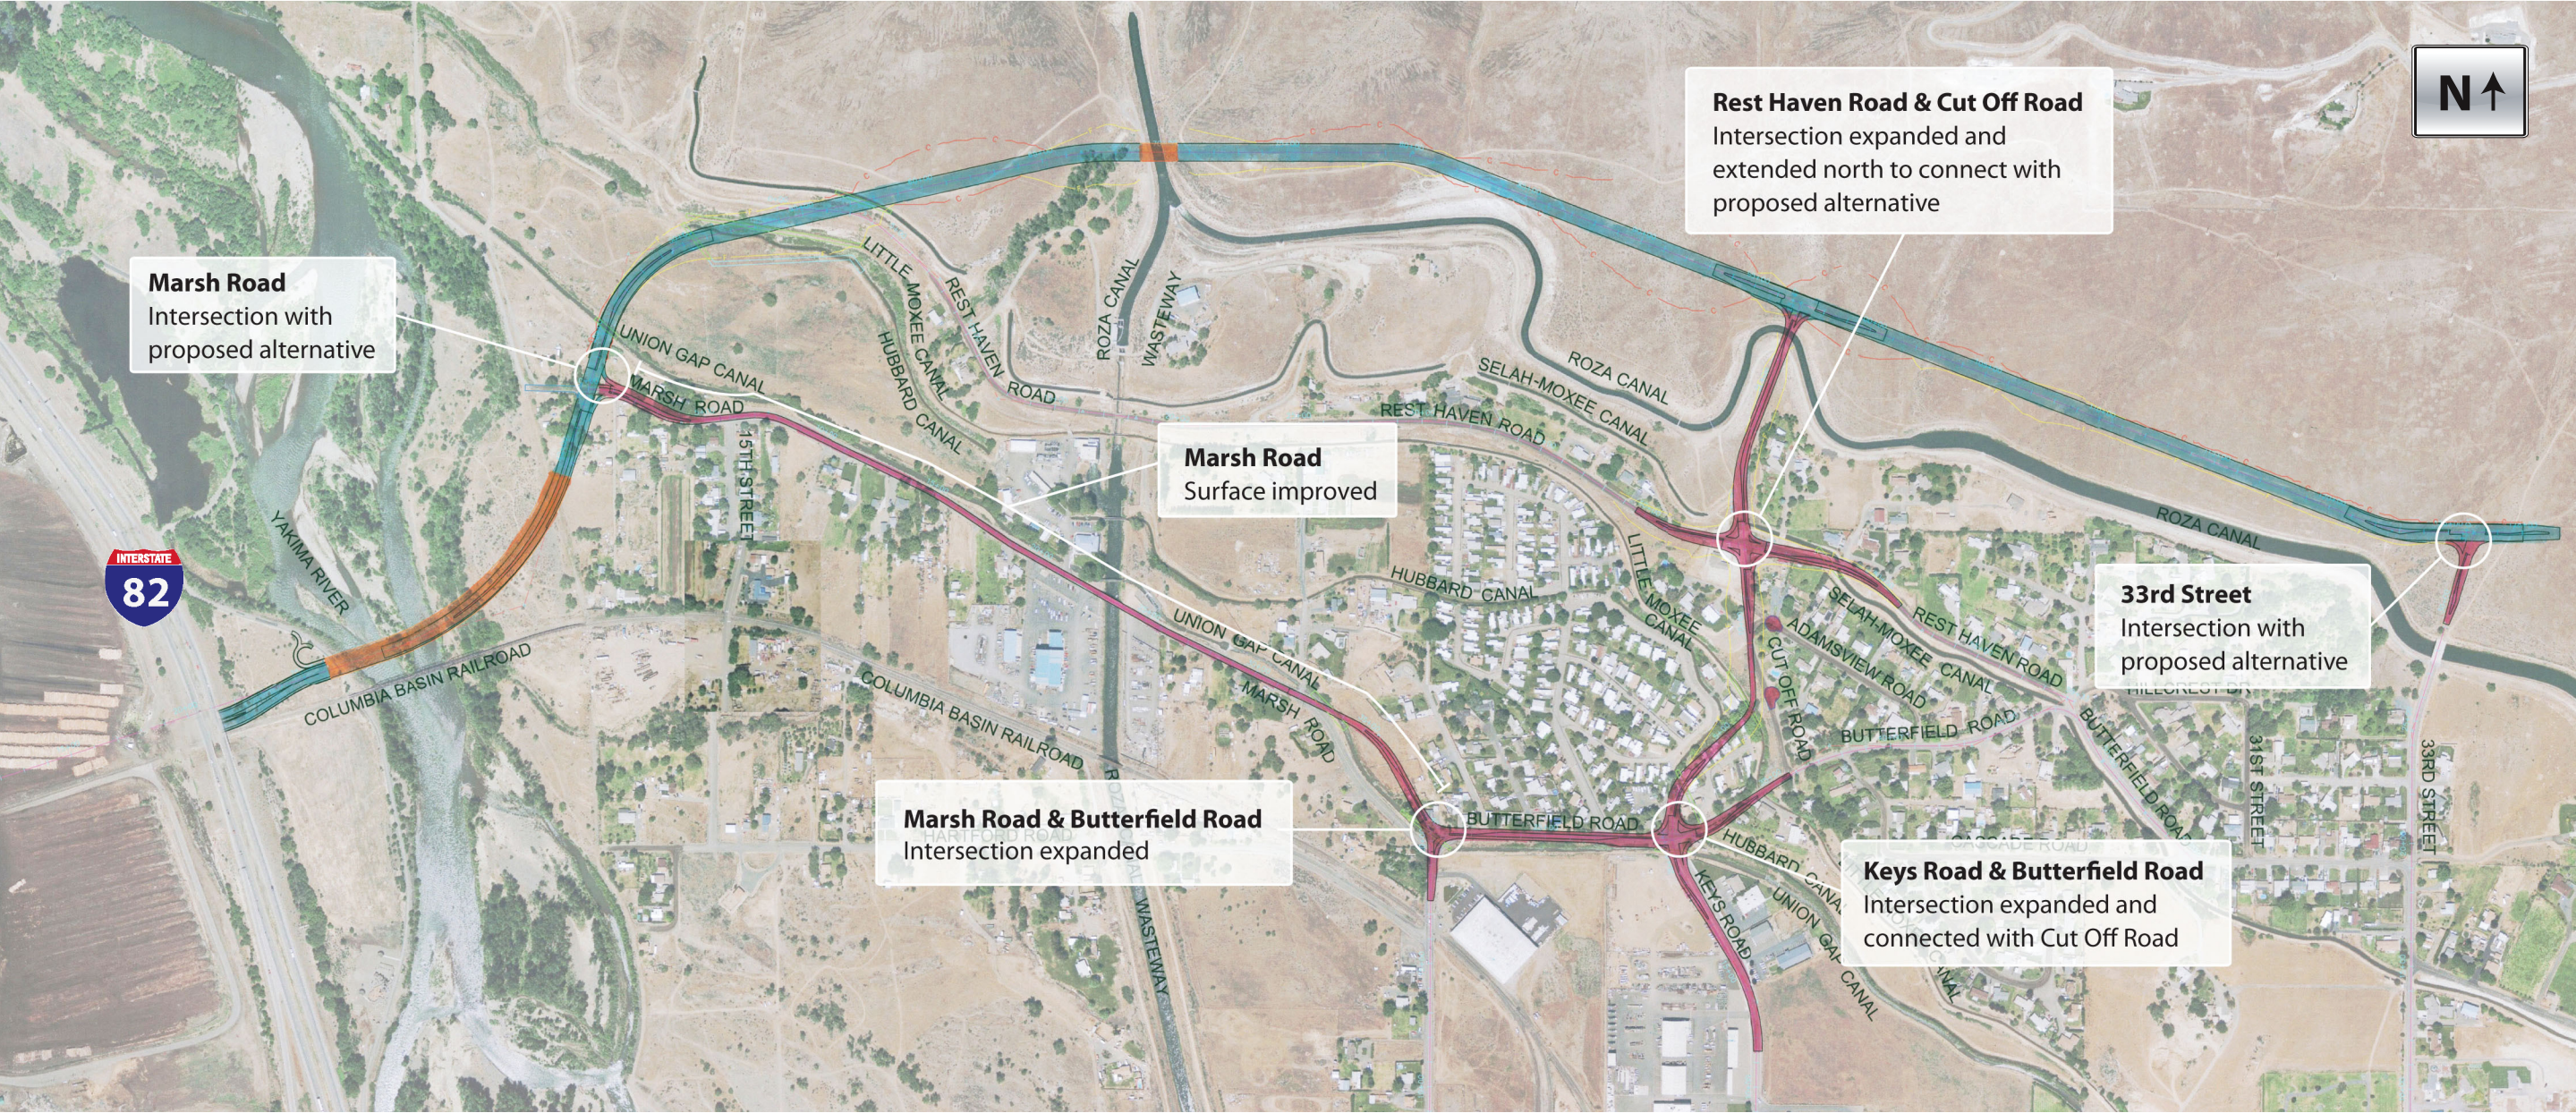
Alignment Alternative 2 – Rest Haven Bench – Suggested Improvements to Existing Roadway Network
